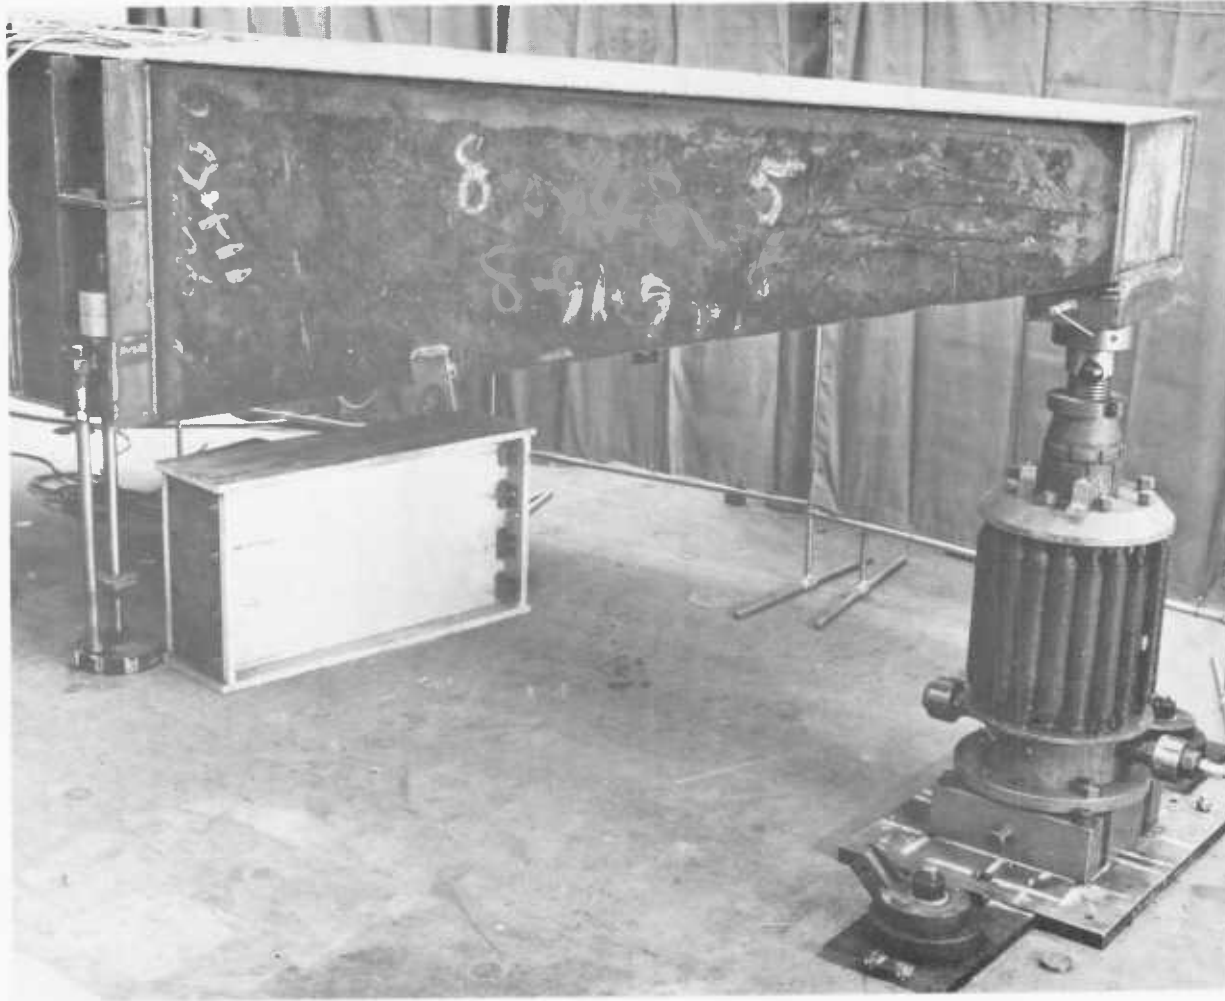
End loading unit used for Models 2, 4 and 8. The 100 ton Amsler hydraulic jack and the holding-down bolt at model/loading unit junction can also be seen.
